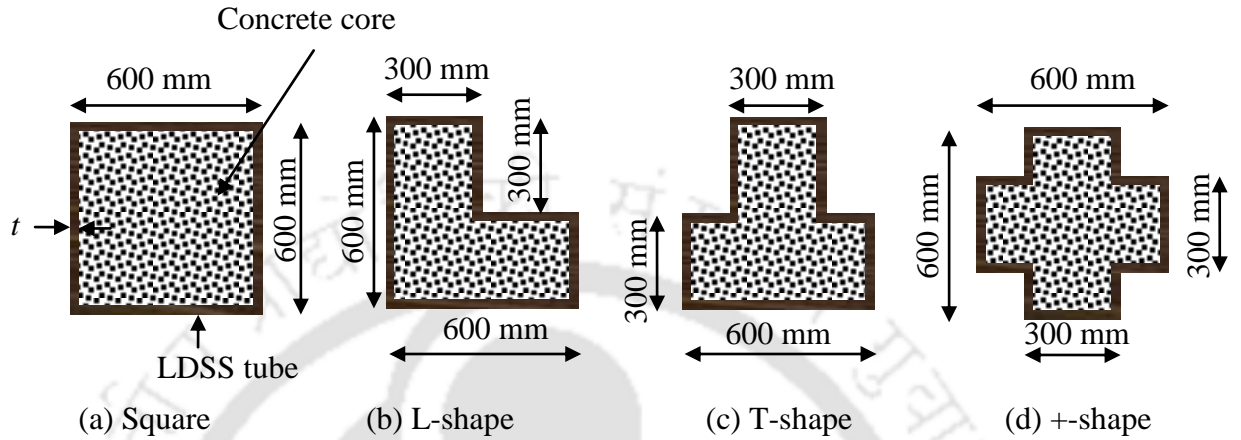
Numerical test specimens of the fixed-ended CFDSST slender columns.
